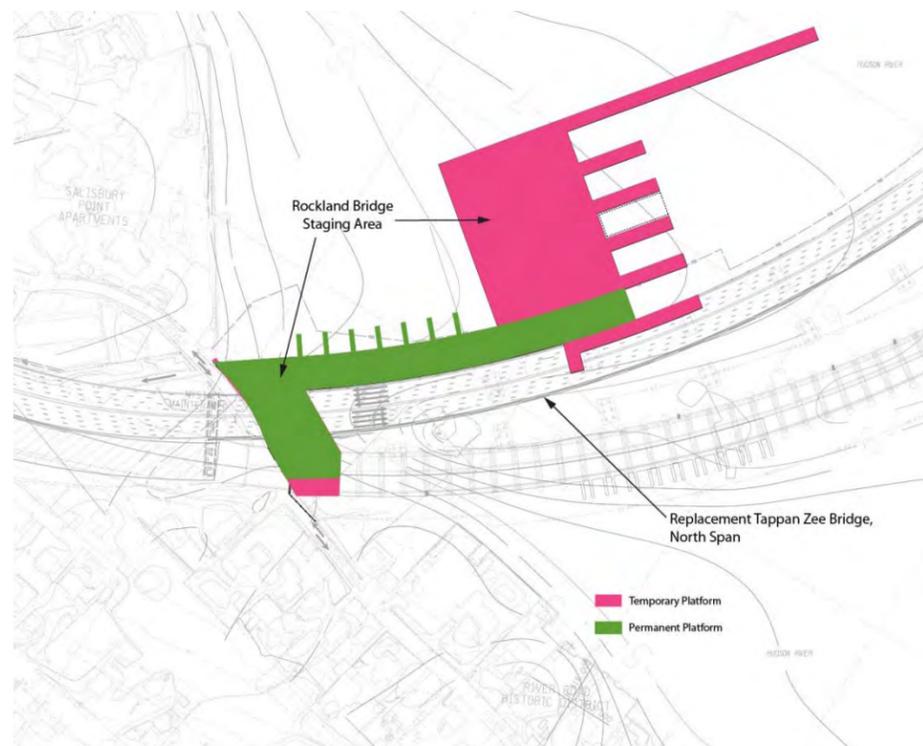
Rockland Bridge Staging Area (RBSA)
